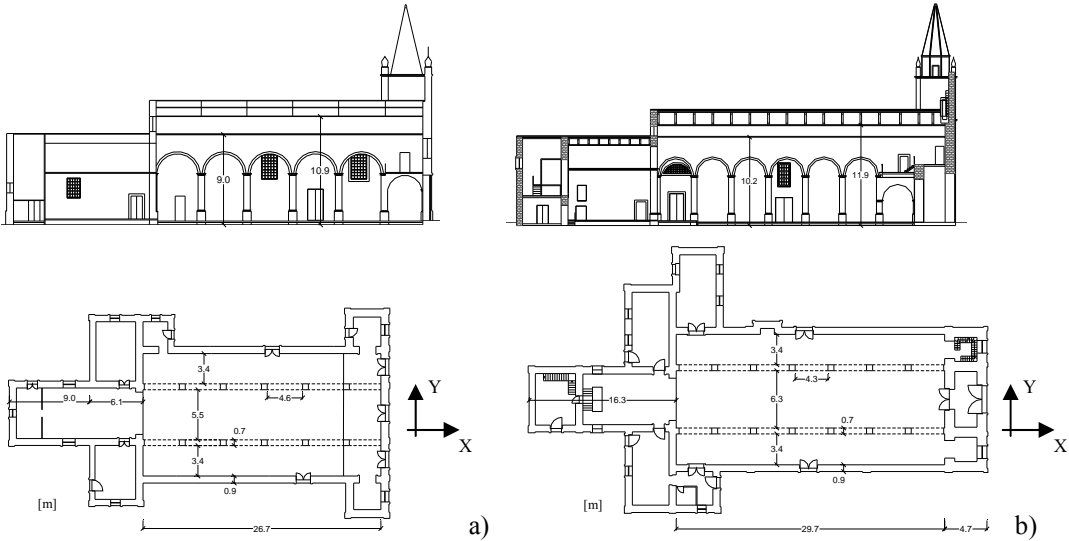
Plan and longitudinal cross section views of the Bandeiras (a) and the Madalena (b) churches
